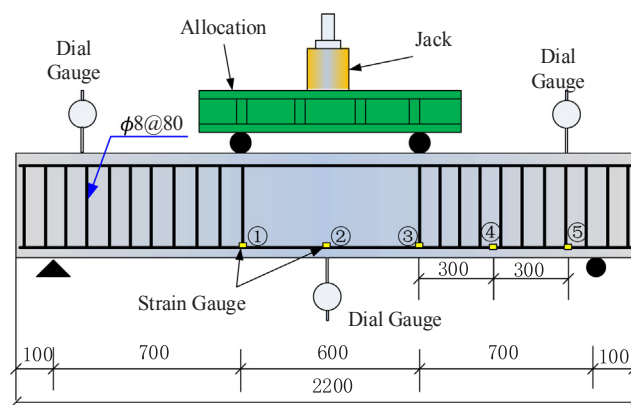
Design and loading diagram of the test specimen (unit: mm).
